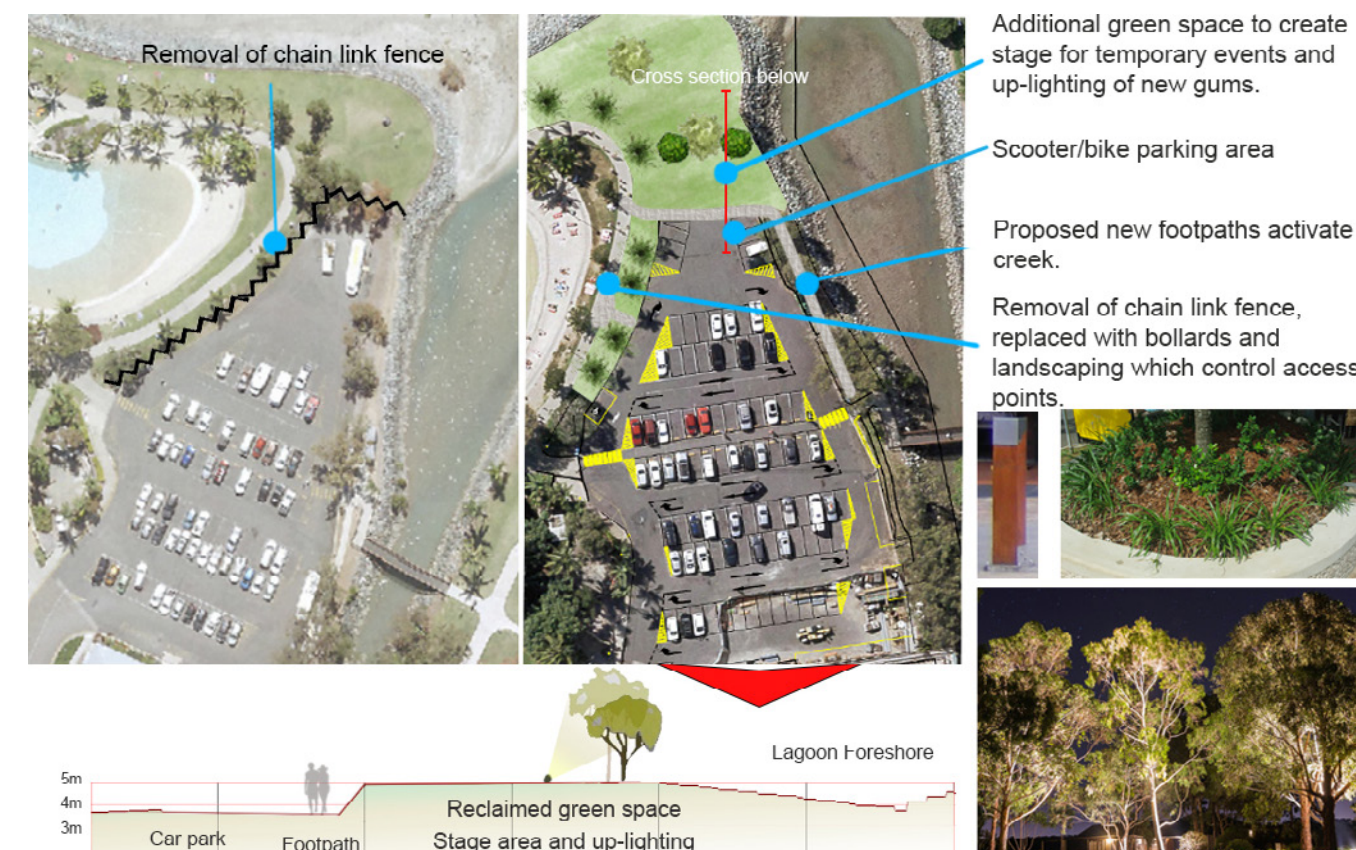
Proposed landscaping, lighting and stage upgrades within the Central Lagoon car park.
